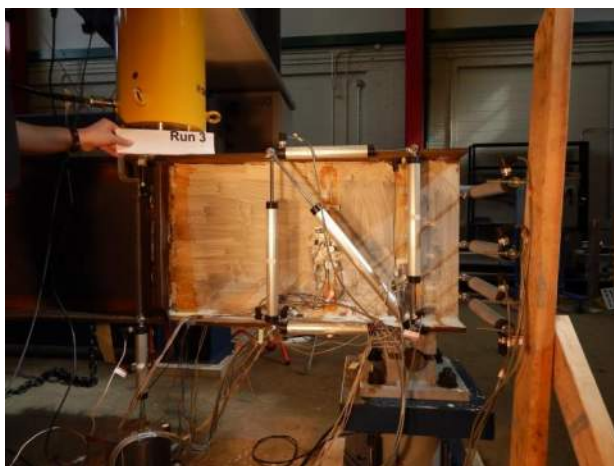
Undamaged Girder Left: 80 kip
